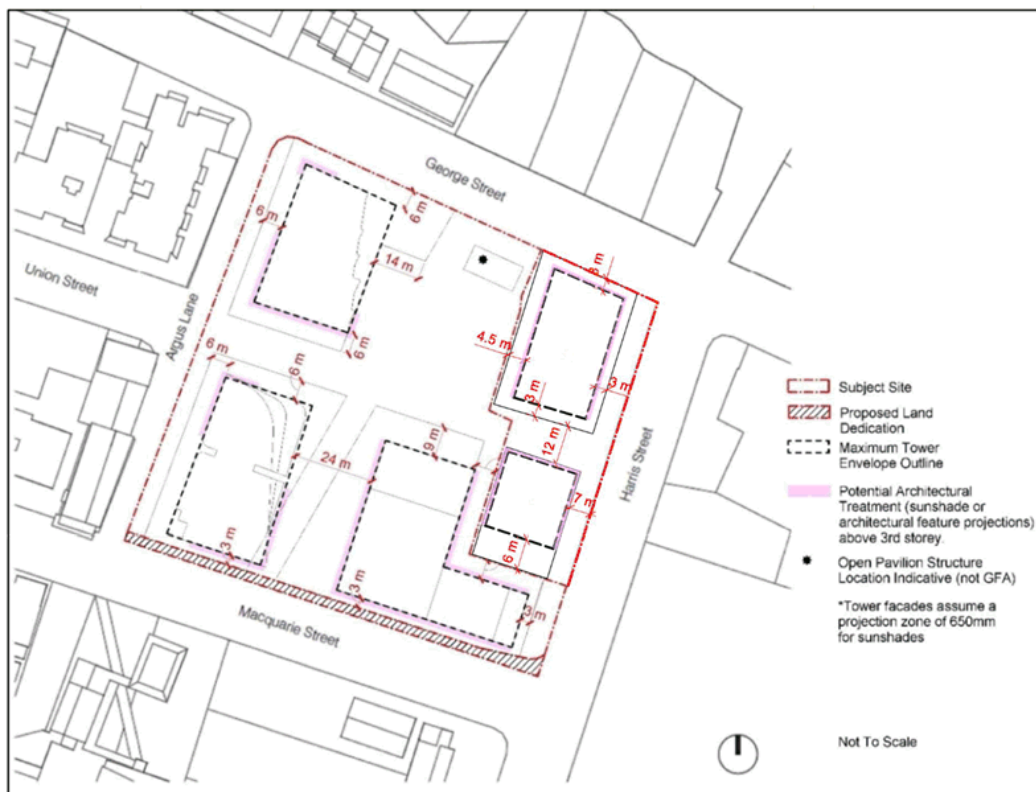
Control diagram: Setbacks to towers above podium on former Cumberland Media Site
